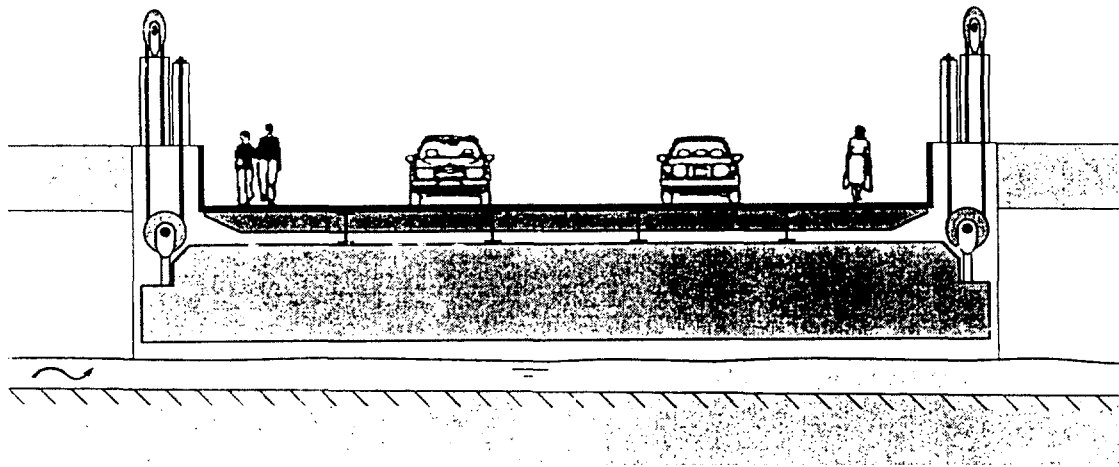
Elevation bridge at Brig, Switzerland. The roadway rests on two abutments that may be elevated by 2.8 m.
